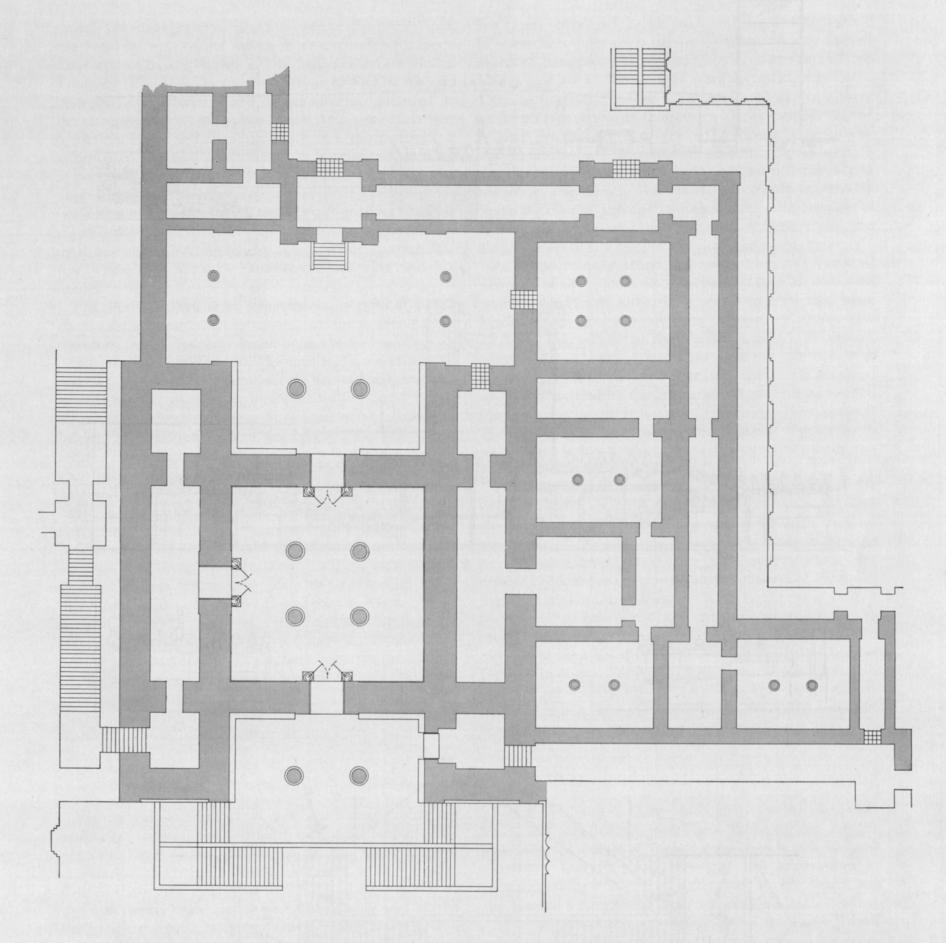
Reconstructed Plan of Council Hall. Scale, 1:300
